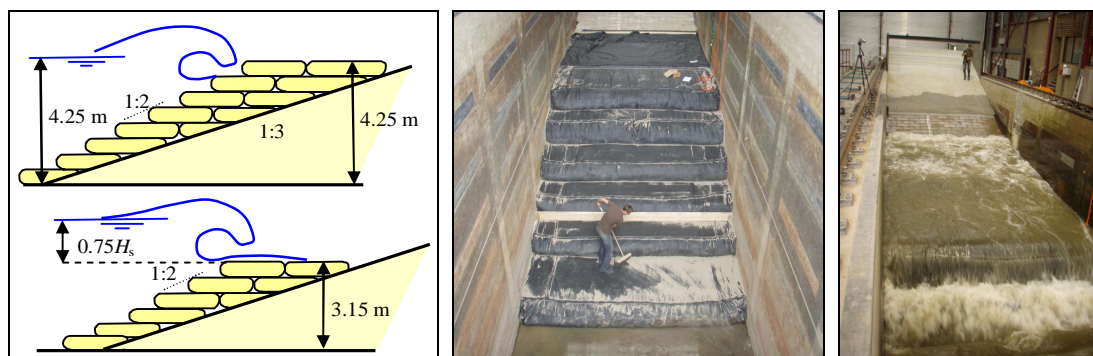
Schematized test set-up of geotextile containers; test set-up prior to test-run; test-run
